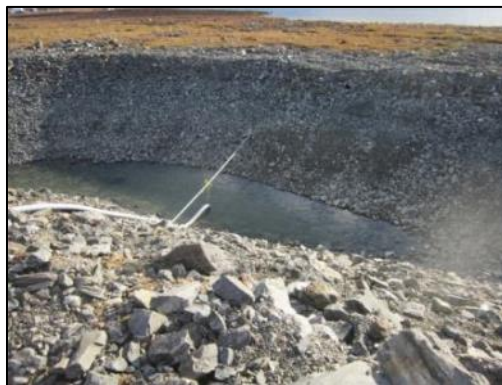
Point of seepage through the road at the Assay lab, located to the bottom right of Photo 42.
